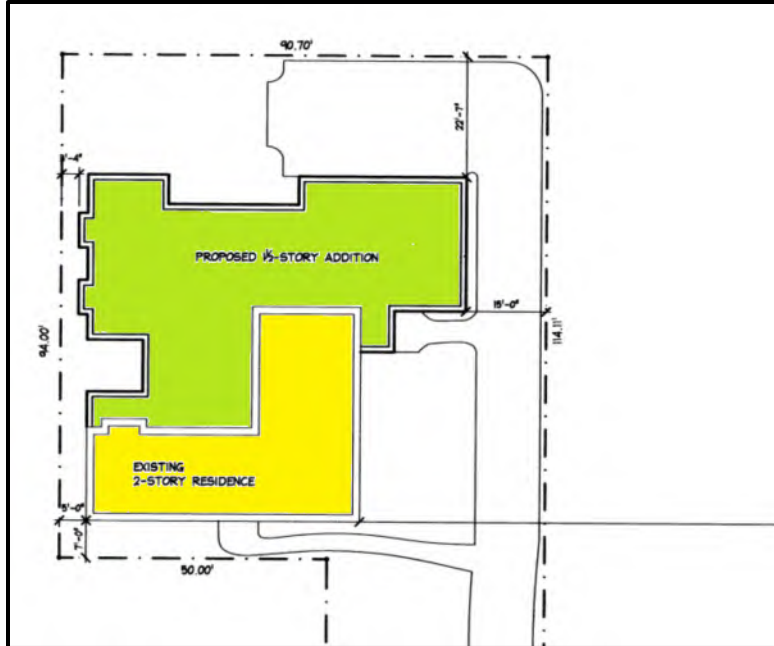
Previously proposed Site Plan from 2009 showing original house in yellow and large addition in green.
